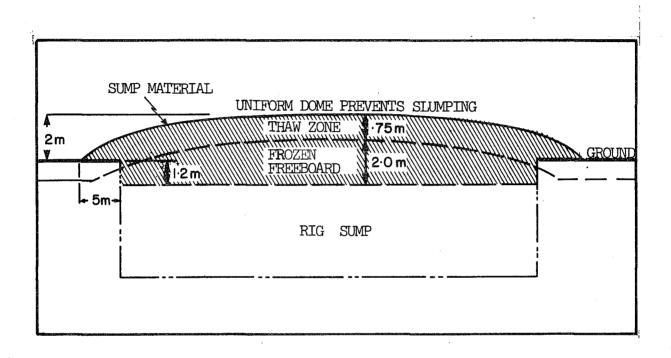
Schematic of Disposal Sump After Backfilling. (Adapted from French, 1978)
